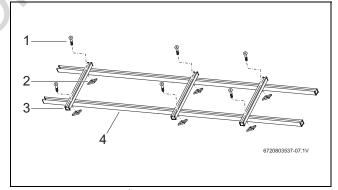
Securing flat roof/rooftop profile rail to collector profile rail
